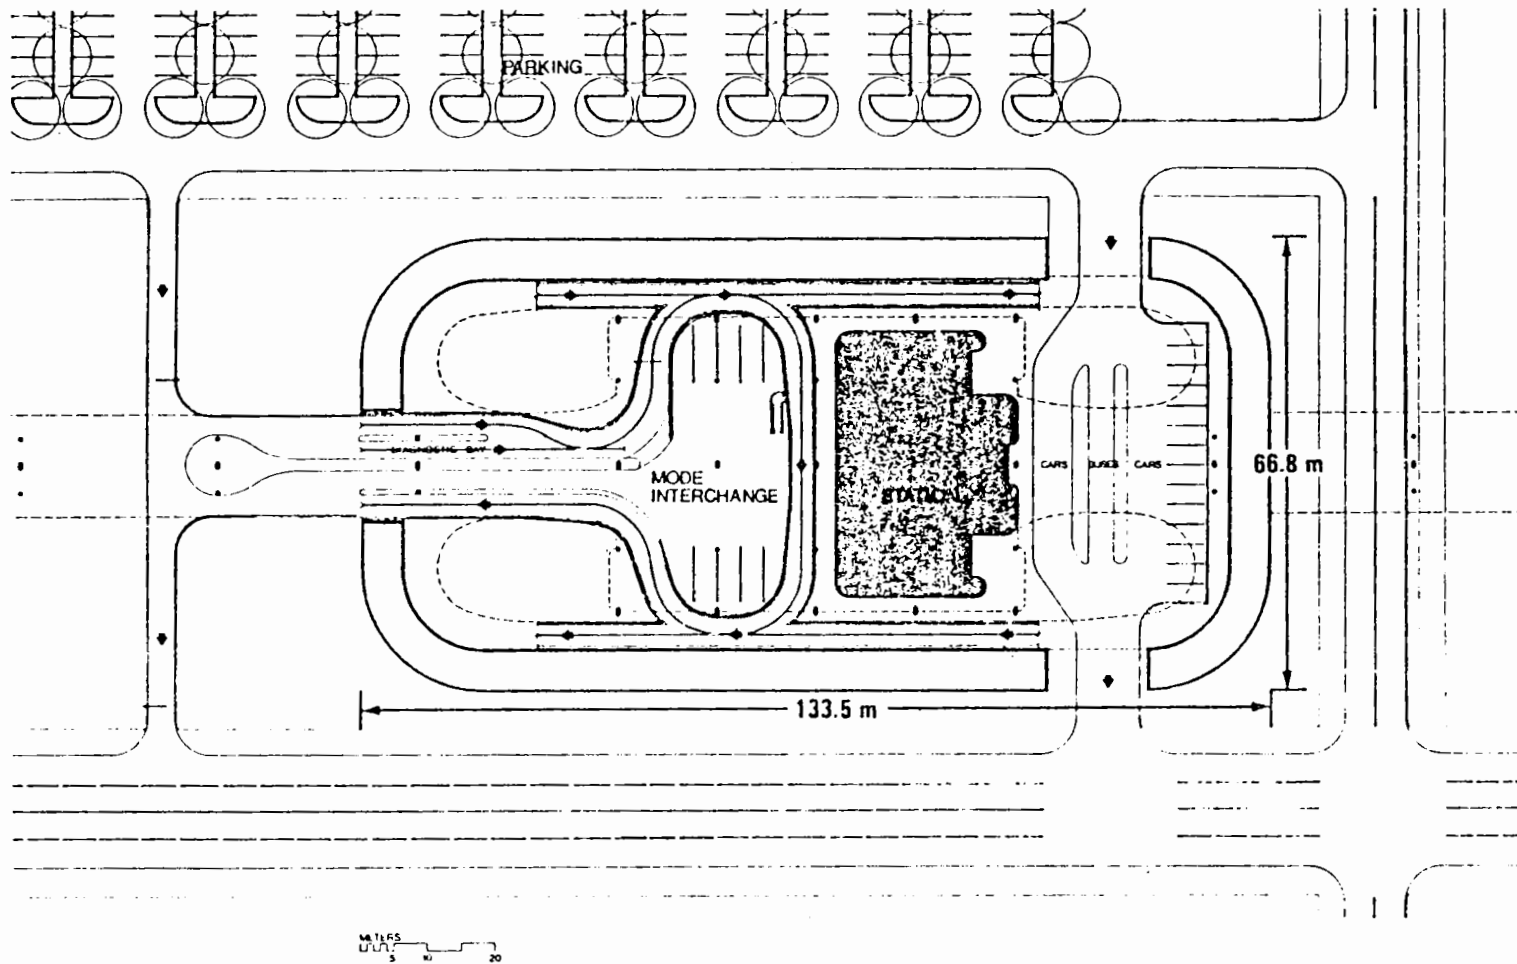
3-Bay Corridor Site Plan (Source: Reference 21)
